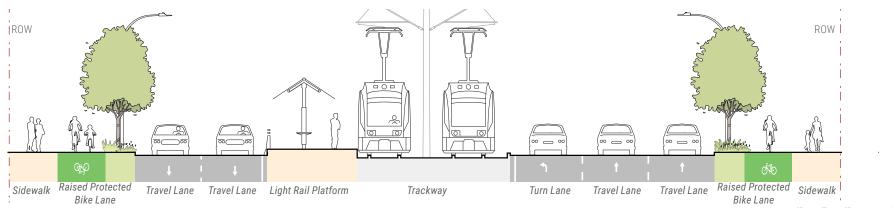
DRAFT 30th Avenue Station Cross Section
